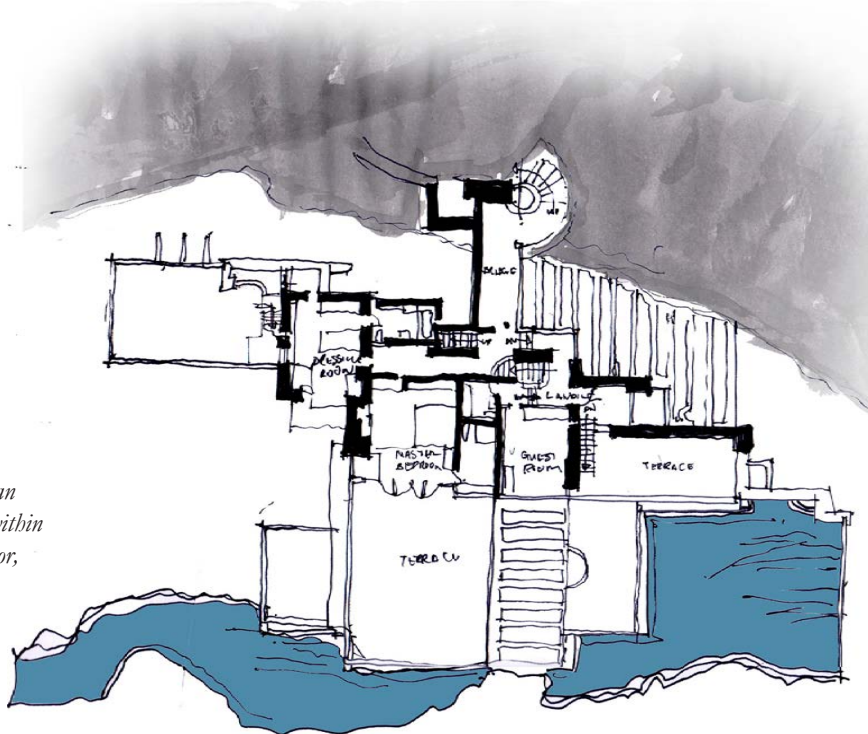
Floor Plan situating architecture within natural context (Author, 2018)
